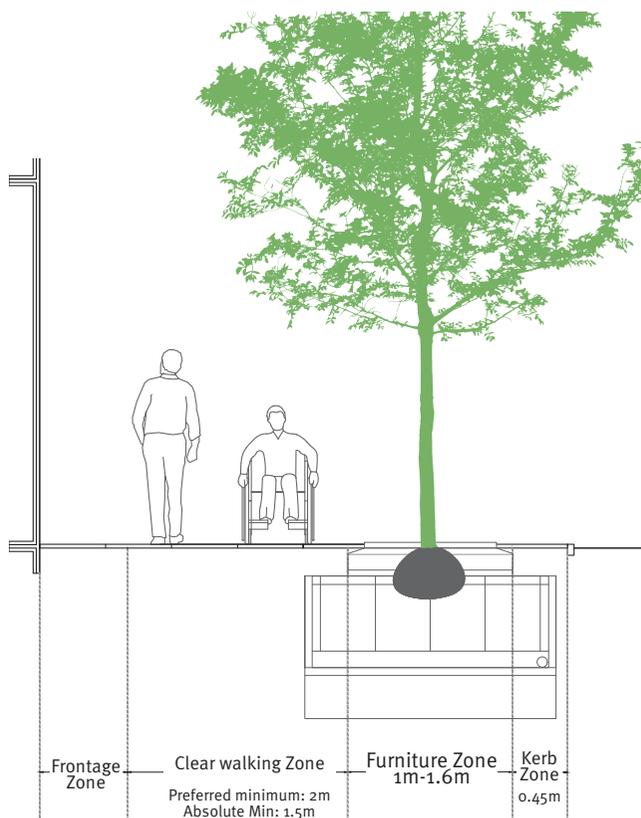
Fitting a SuDS Tree Pit into a street | Atkins
